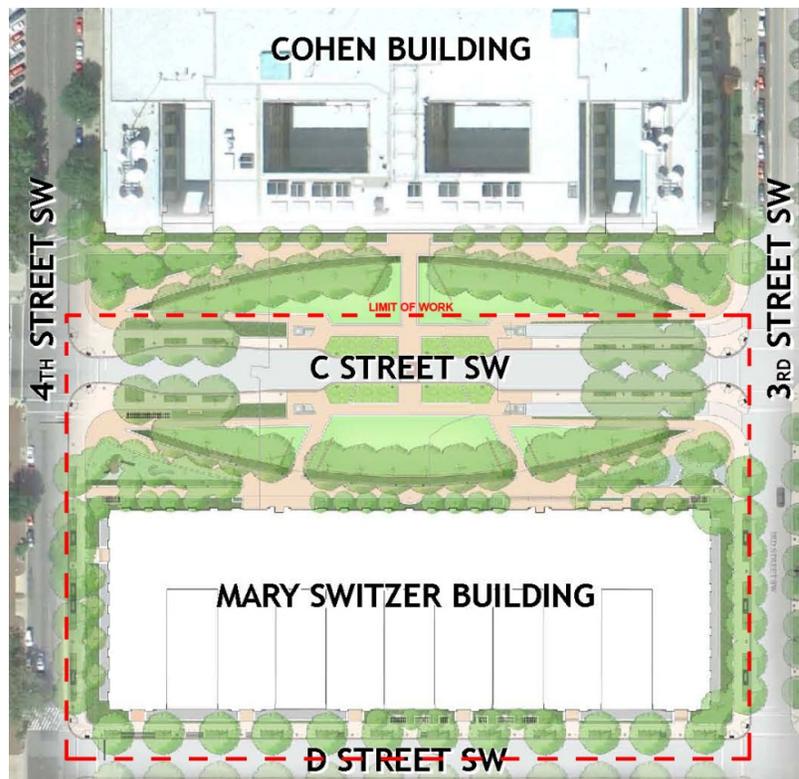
Illustration showing proposed site plan of Switzer Building site improvements and concept of unified open space precinct between Switzer and Cohen, (limit of proposed site improvements and perimeter security shown in dotted red outline)
